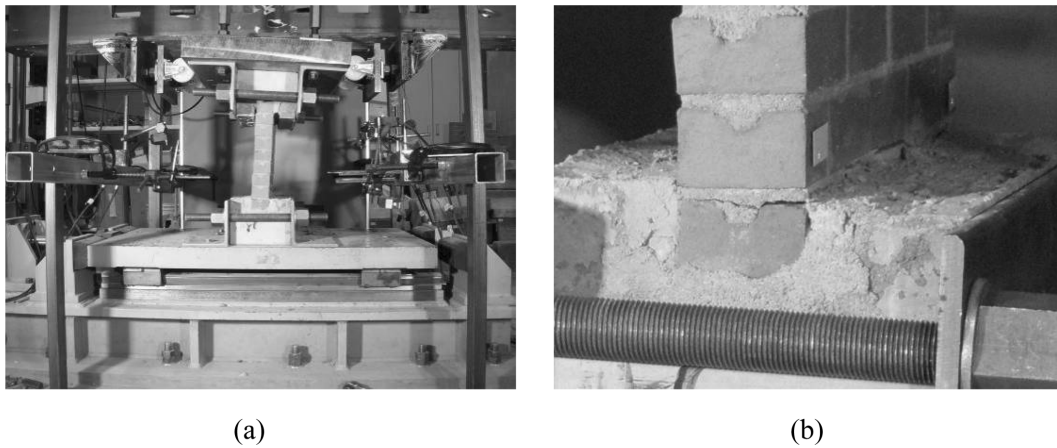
Deformed shapes for the URM specimen: (a) deformed shape and (b) bed joint cracking
